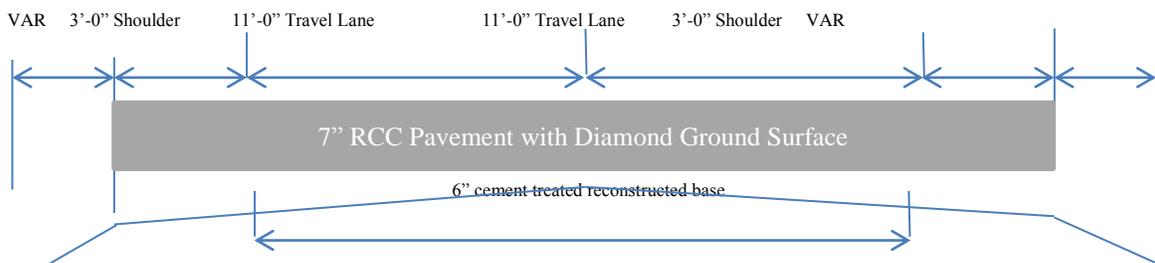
Diagram. Section 1 typical pavement from log mile 2.02 to log mile 2.88 of State Highway 213.
